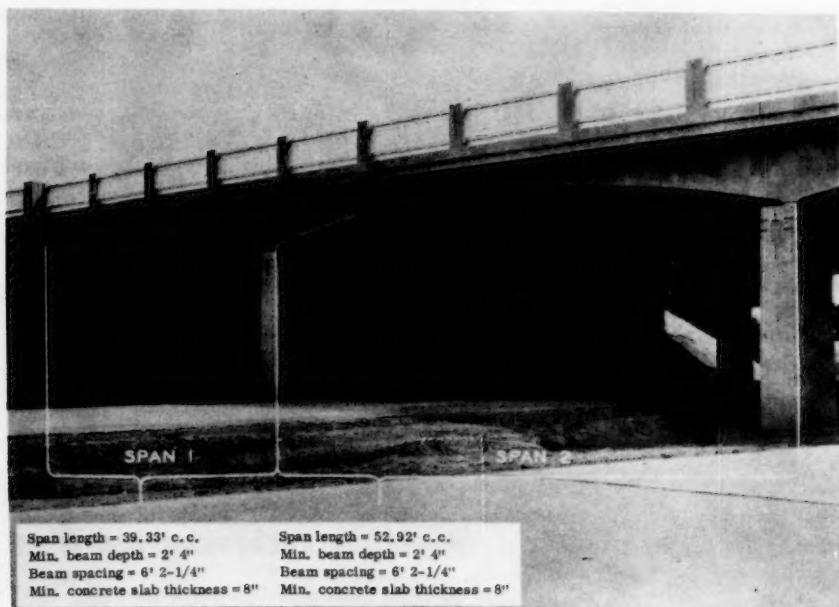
Bridge B5 of 81-11-8. On route US-23 south of Ann Arbor. Four-span reinforced concrete tee-beam bridge.
